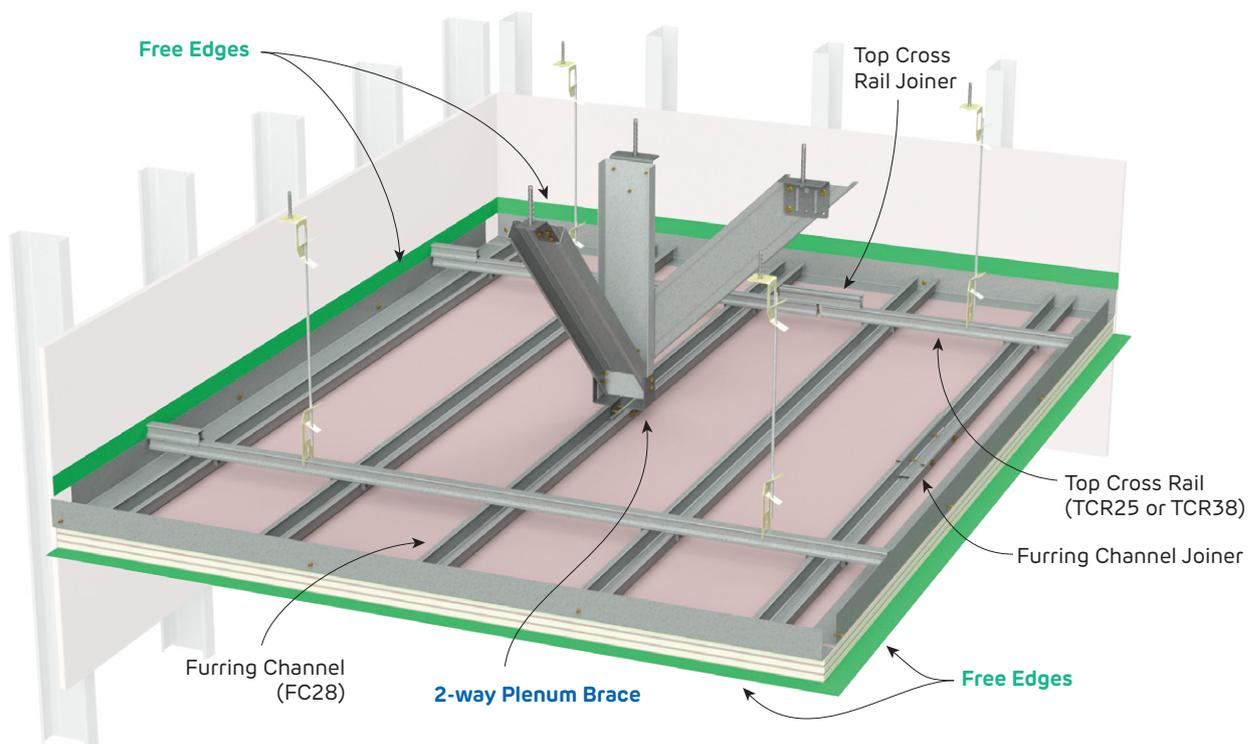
Suspended Ceiling Frame - Type C, 2-way Plenum Braced
